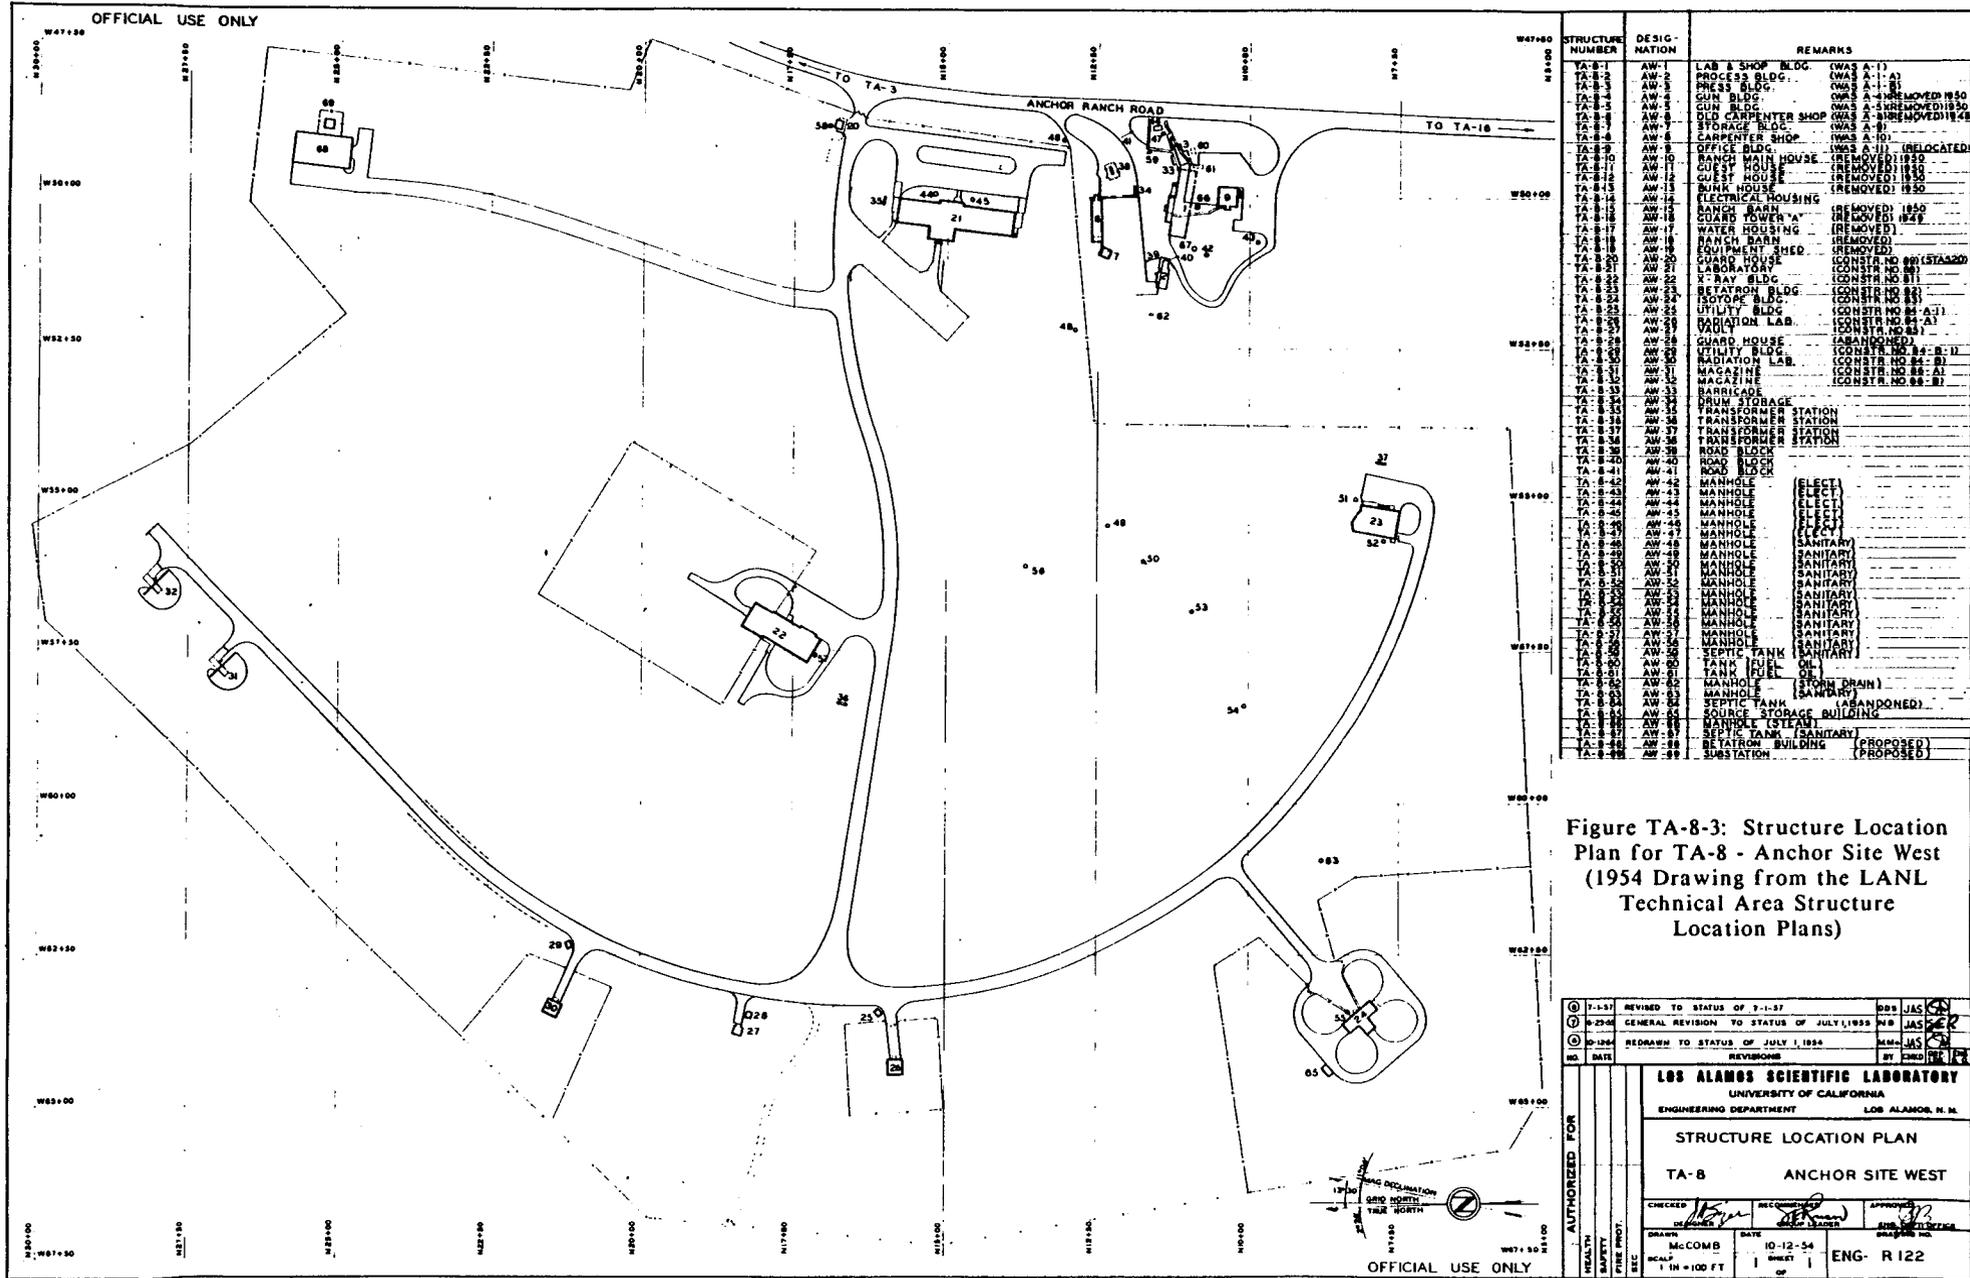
Structure Location Plan for TA-8 - Anchor Site West (1954 Drawing from the LANL Technical Area Structure Location Plans)
